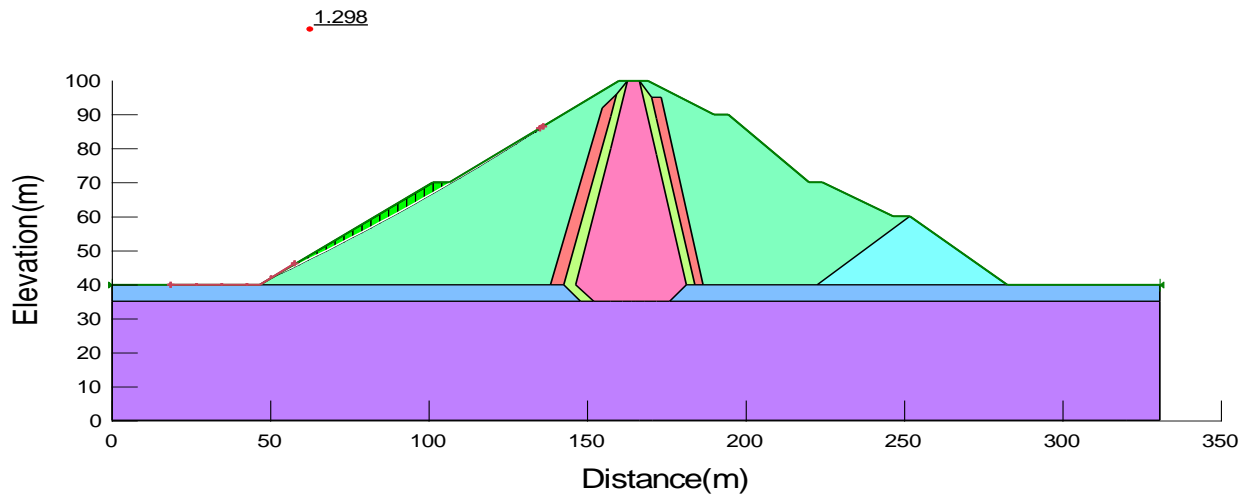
Slope Stability end construction with earth quake CC (U/S)
